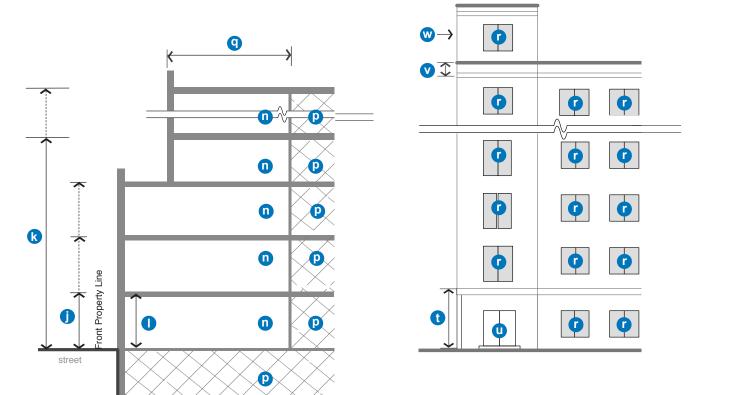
(2). General Stoop Building: Height & Use Requirements.
